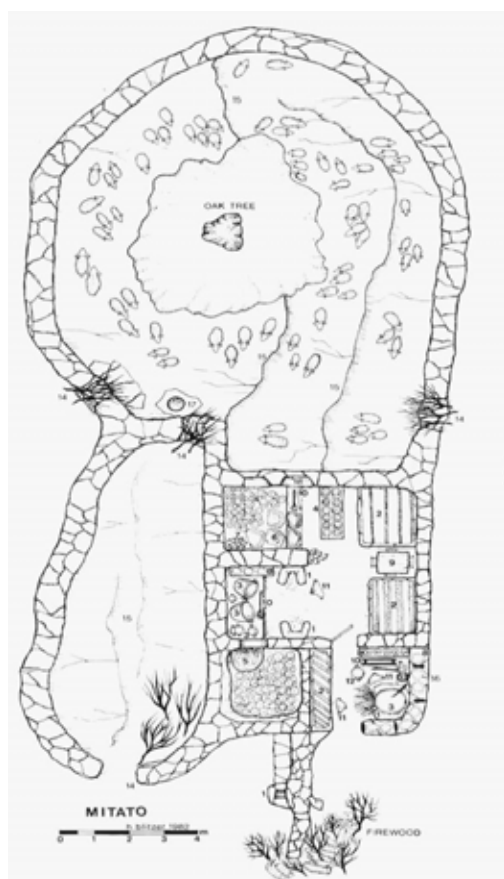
(left). Plan of a *mitato* (numbers 1-18 on plan) built of limestone. The entrance to the building faces north.
